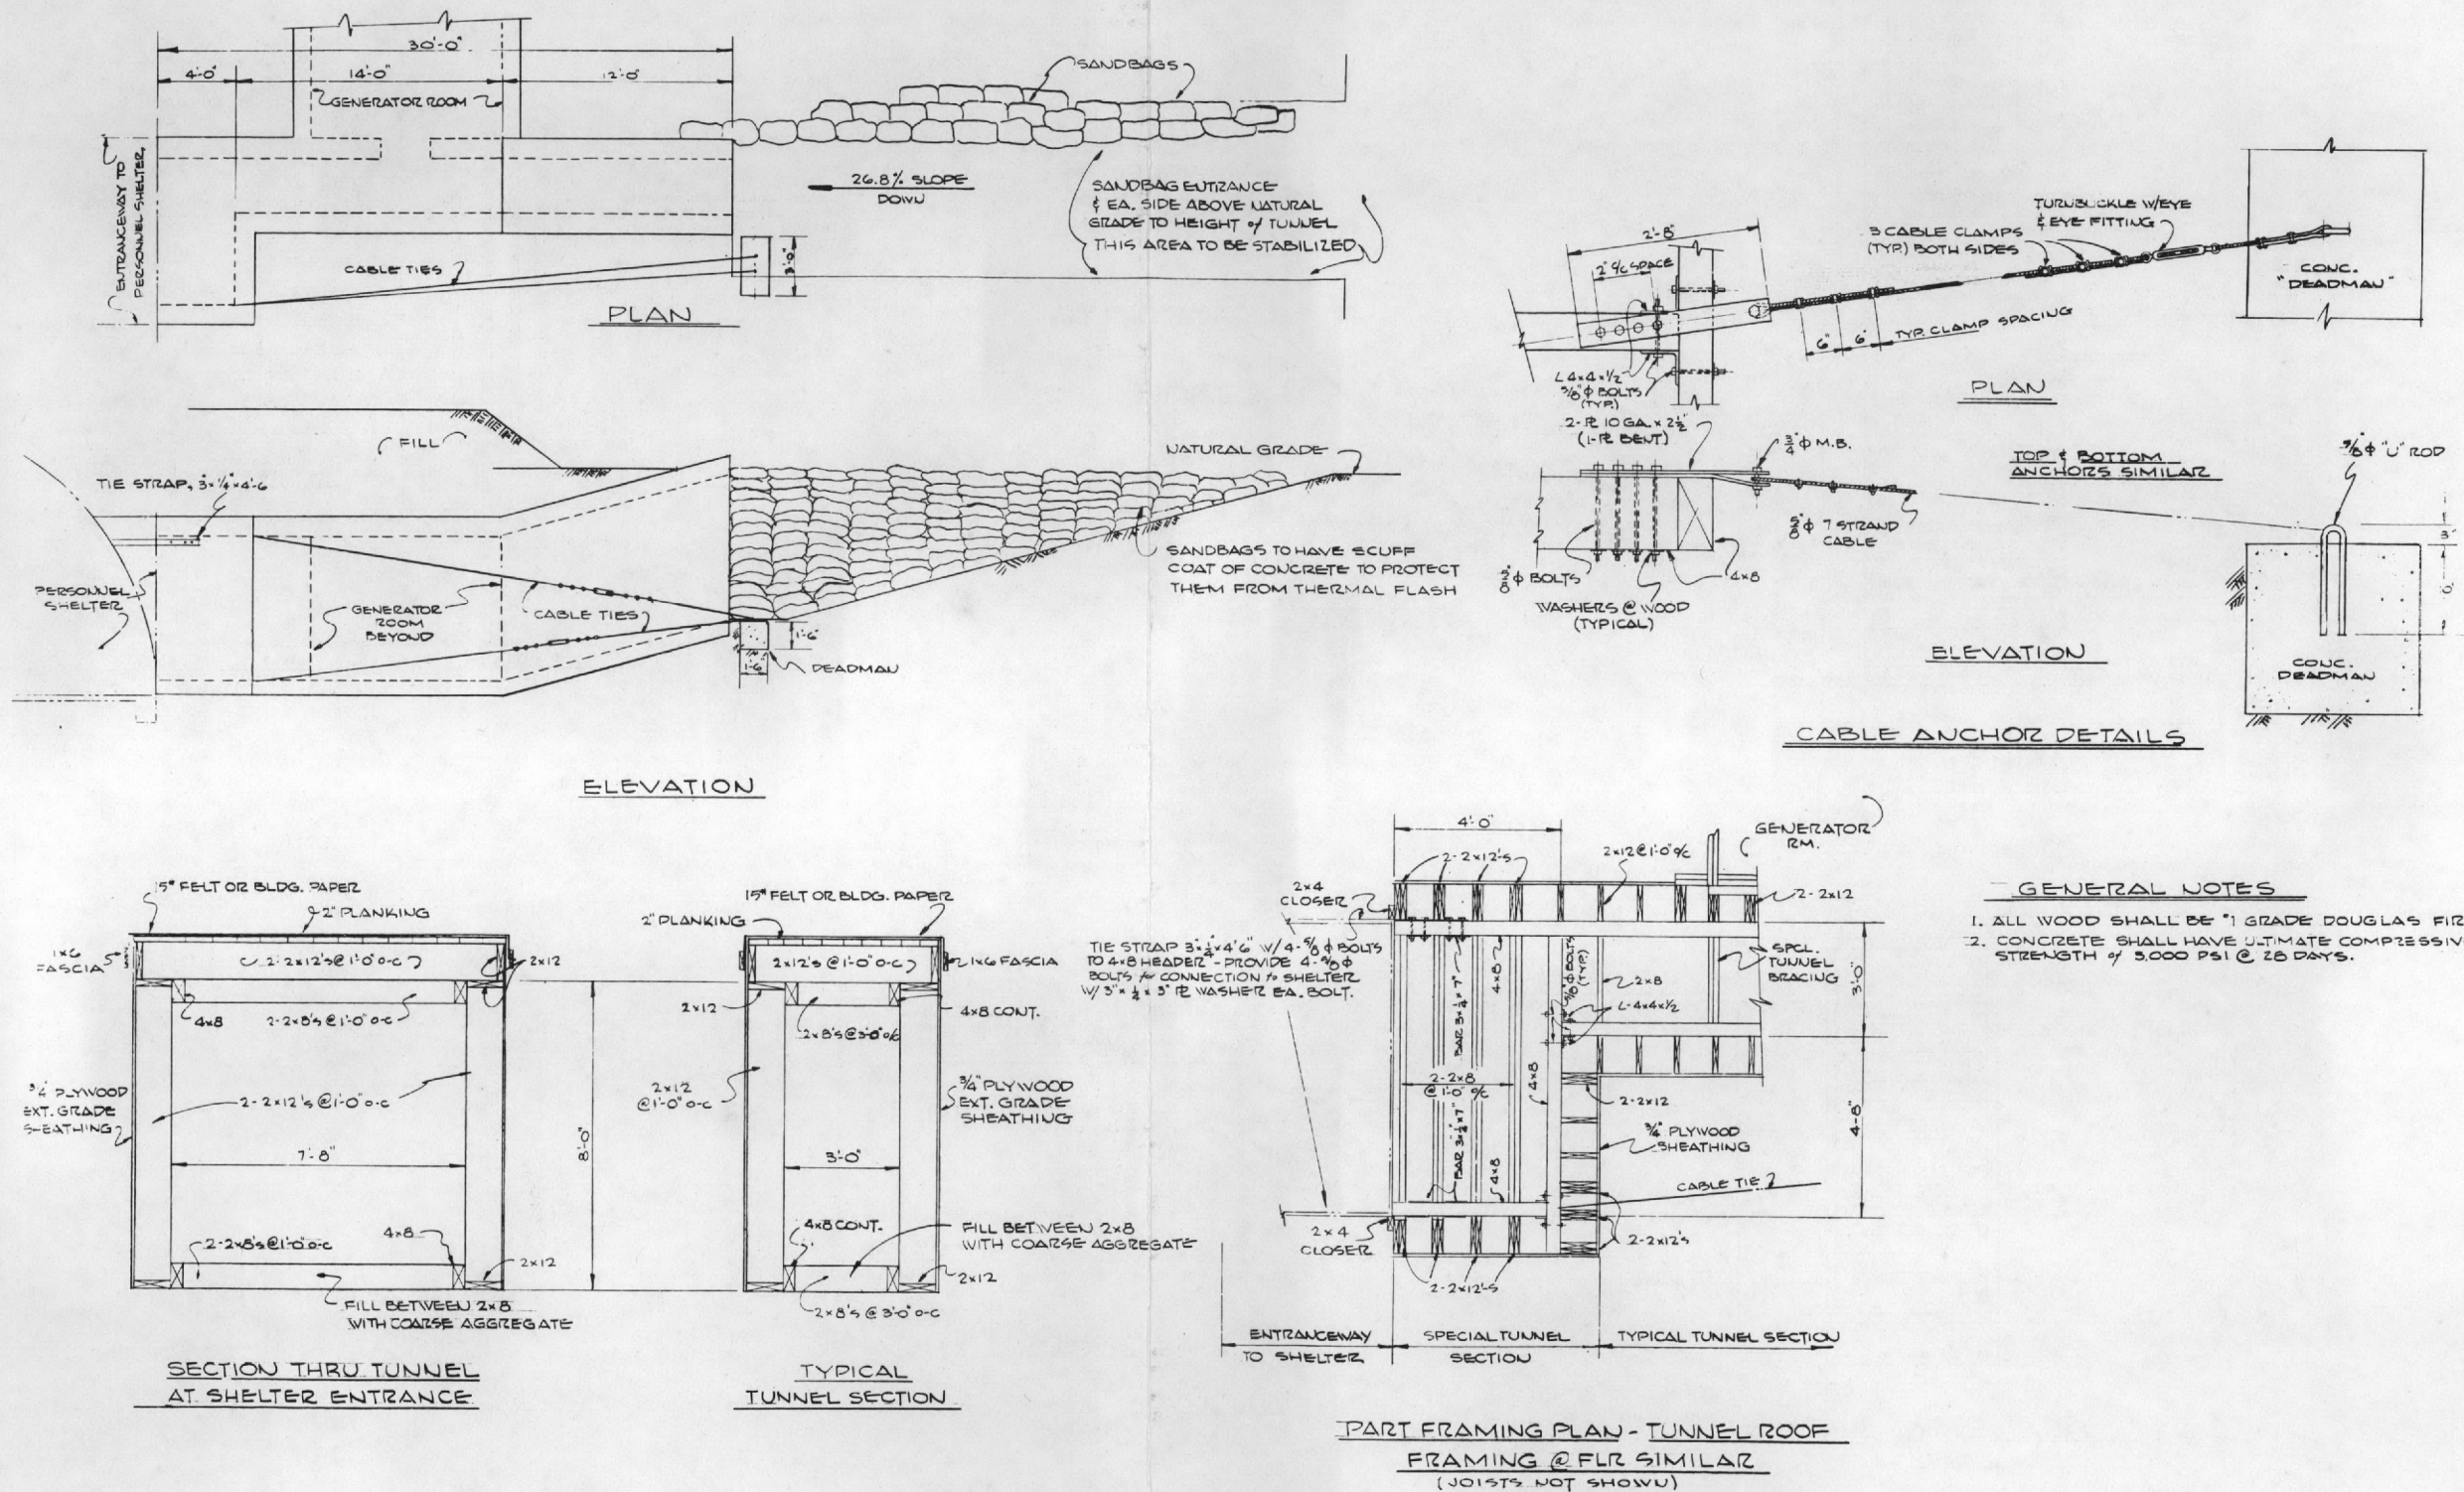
Underground Personnel Shelter - Entrance Tunnel Details.
